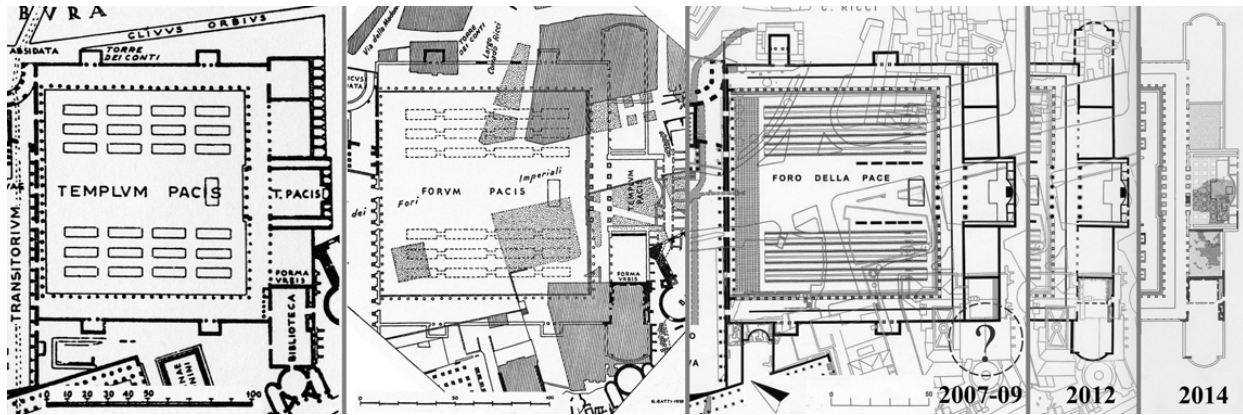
Plans of the *Templum Pacis*. From left to right: Italo Gismondi's plan (1941–1946) (from Lugli 1946, pl. 5); plan by Guglielmo Gatti (1959), from *Pianta Marmorea* 217; plan by Bianchi-Meneghini (2007: note the missing wall toward the Clivus and the absence of the great hall) (from Meneghini, Santangeli Valenzani 2007, 5); the halls in the plan by Bianchi-Meneghini-Zaccardini (2012) (from Meneghini 2012a, fig. 1); the halls in the plan by Azimut s.a.s. (2014) (from Meneghini, Rea 2014, 257, fig. 1).
